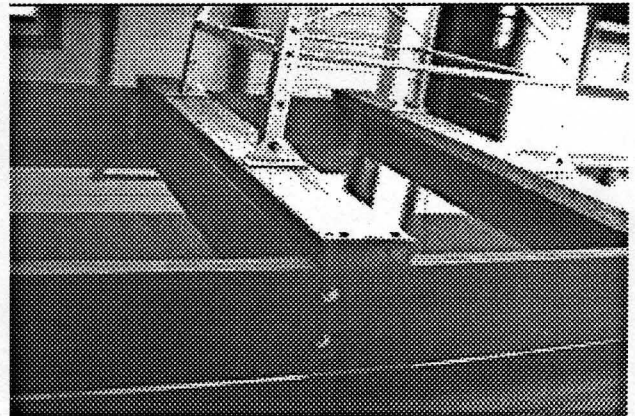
Platform constructed to support the 20-foot aluminum tower. Base of tower is shown resting on the platform but is not yet bolted to the platform.
